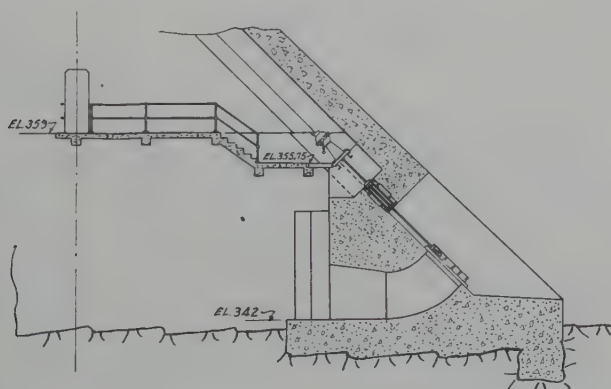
TYPICAL SECTION THROUGH SLUICE GATE
